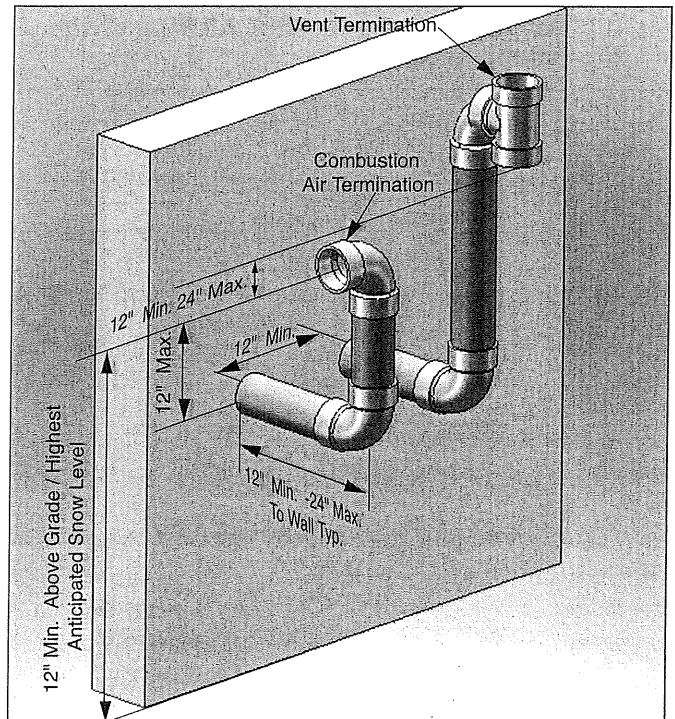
Direct Vent - Sidewall Snorkel Termination of Vent and Combustion Air Piping with Tee Vent Termination
